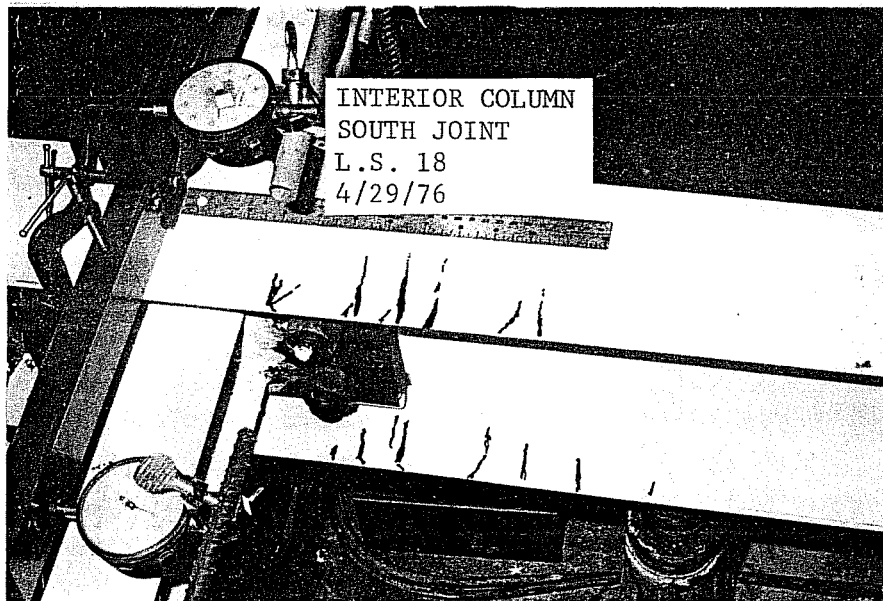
Yielded zone at south joint of interior column of Specimen F3
